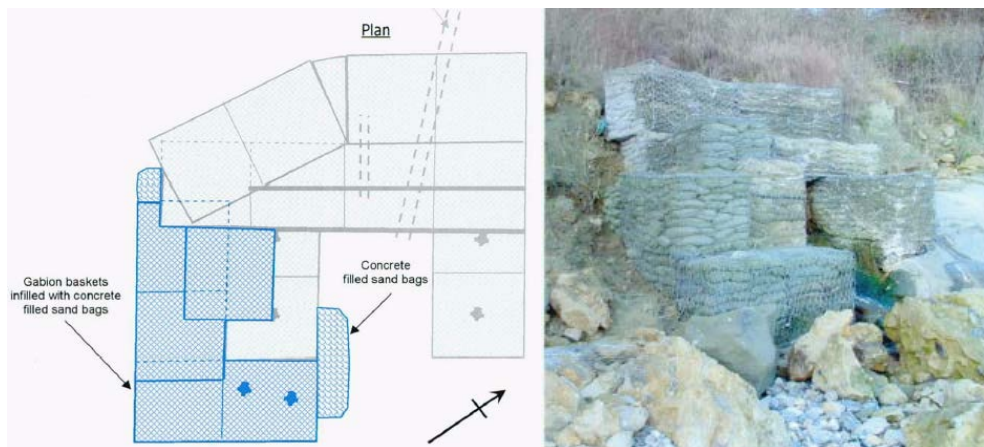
Outfall protection works constructed in 2005 shown in blue and completed in the adjacent photo
